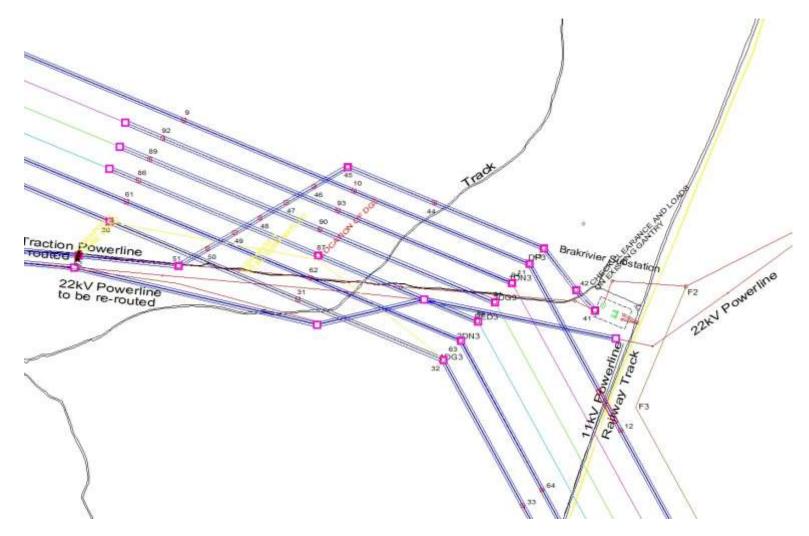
Development plan indicating the proposed construction sites and relevant access tracks that must be used.
